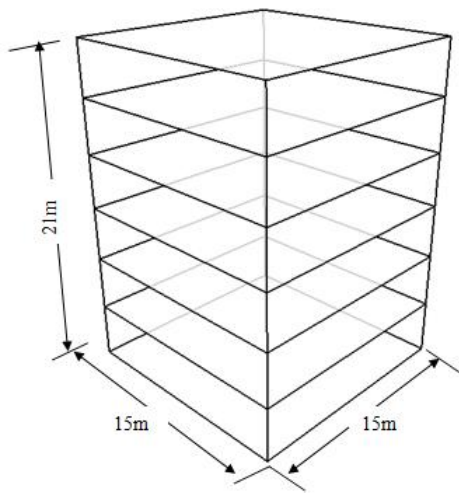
and 6b. 3D six floor of the base case design office building 'Block A' (Source: Authors, 2024).
